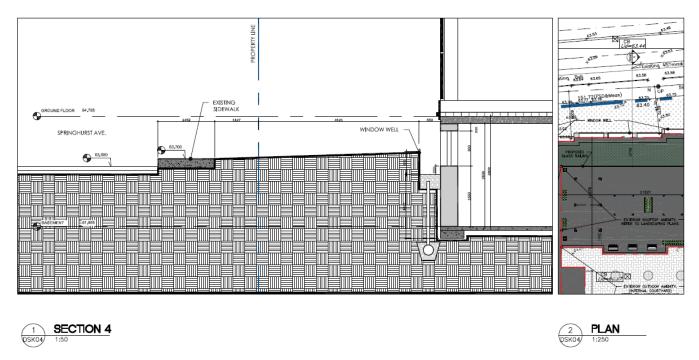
Section drawing through the proposed addition (basement) over Springhurst Avenue
